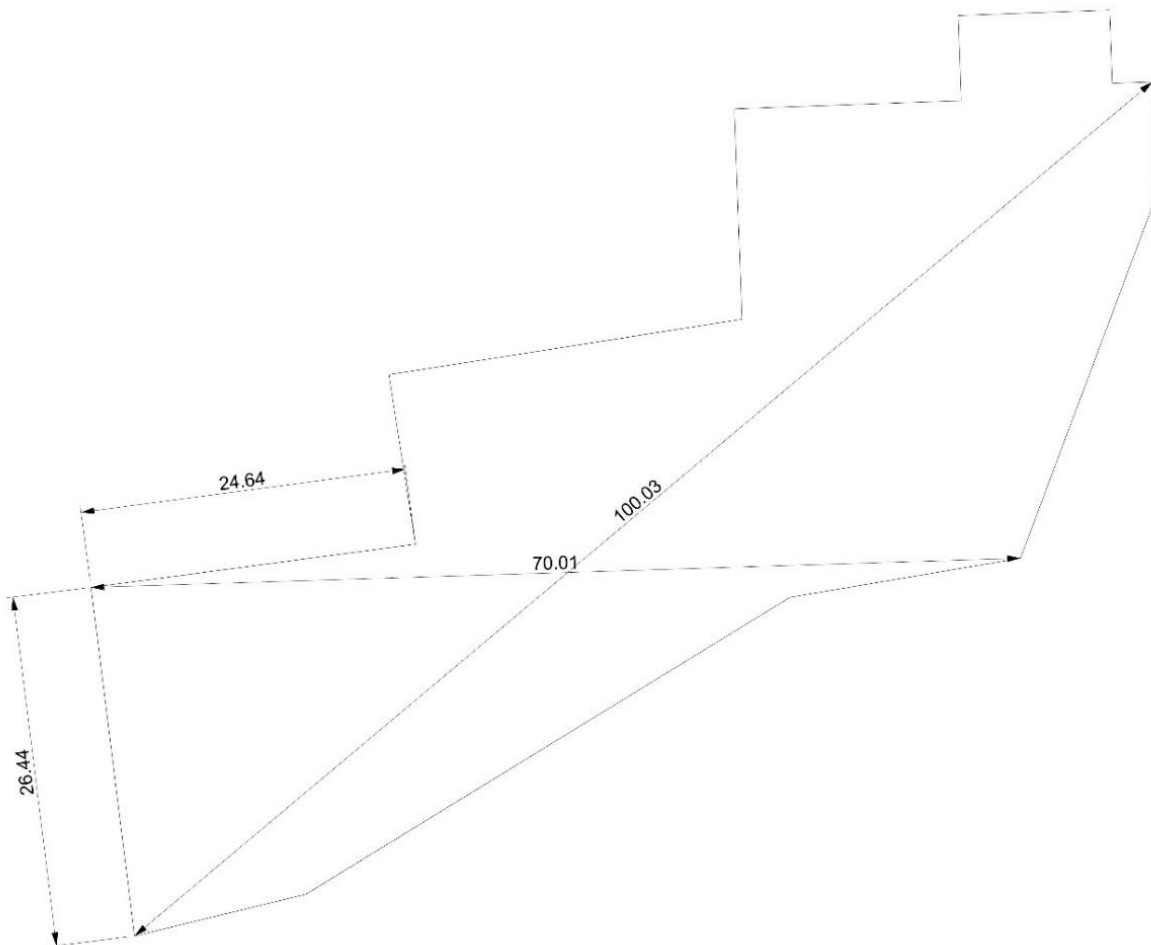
Lor Moughayzel High School for girls, Ashrafieh - Rooftop Plan (units in meter) (Prepared by: author)
